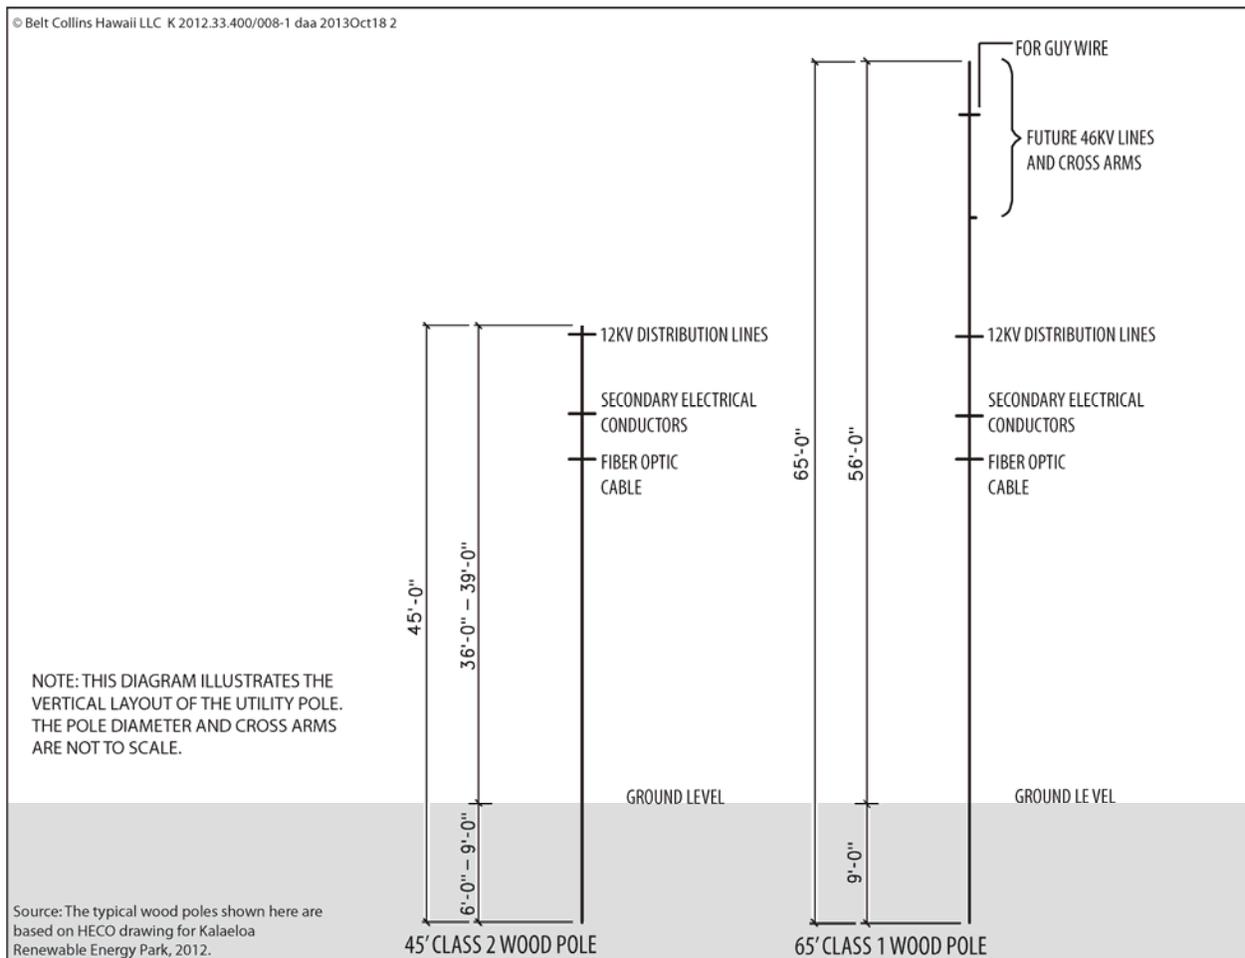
Diagram of Typical 65-foot and 45-foot Utility Pole
